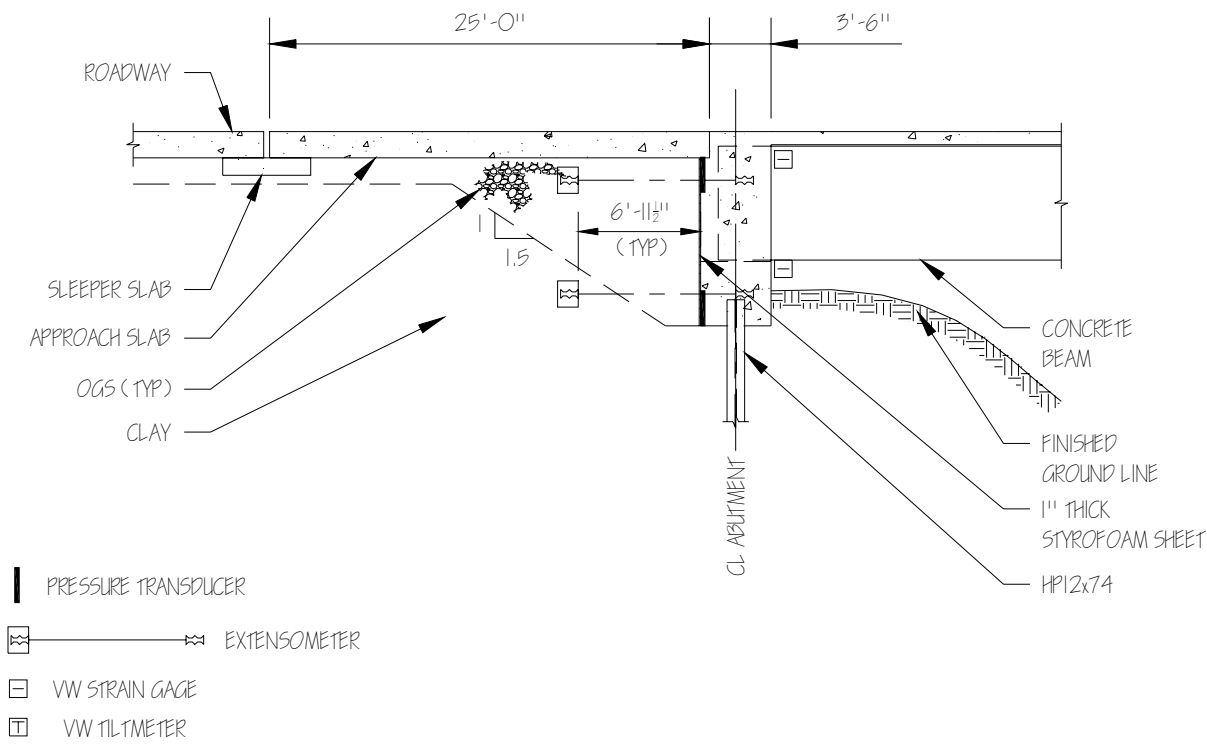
Structure 109 Cross-Section through south abutment (Section C-C)
